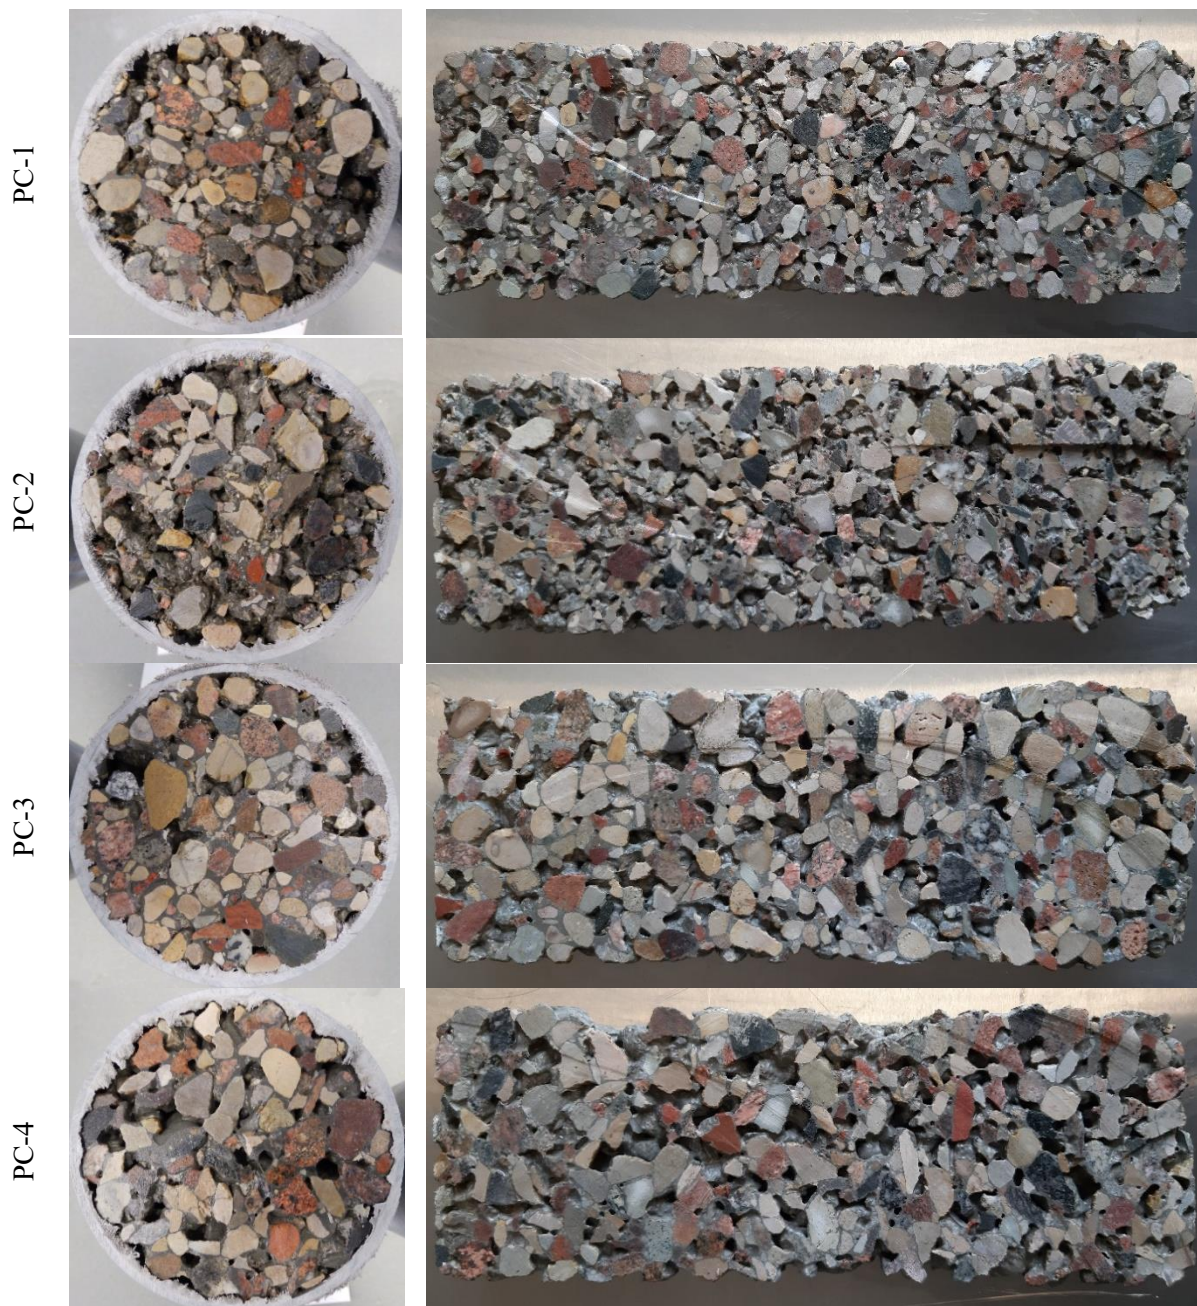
The view of cross and longitudinal sections of PC cylinders (left: cross section, right: longitudinal section).
